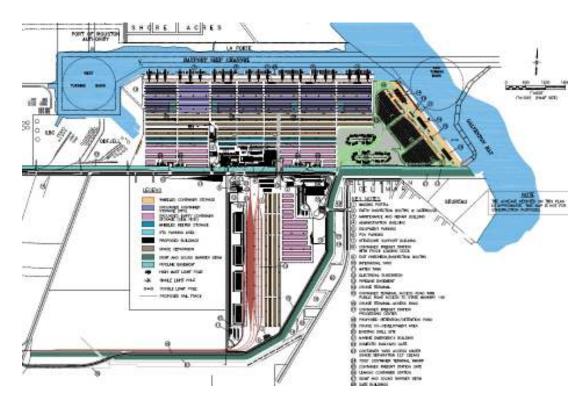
Bayport container terminal master plan (POHA, 2009)
